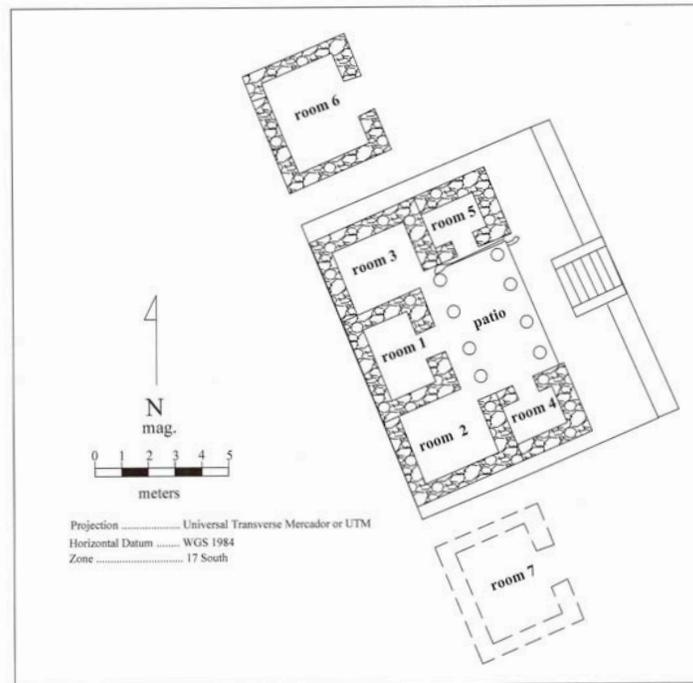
Drawing of *Est 1* after construction Episode 2.
